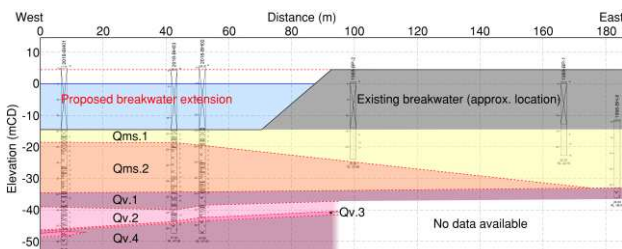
Geological cross-section along the existing breakwater and previously proposed extension.
